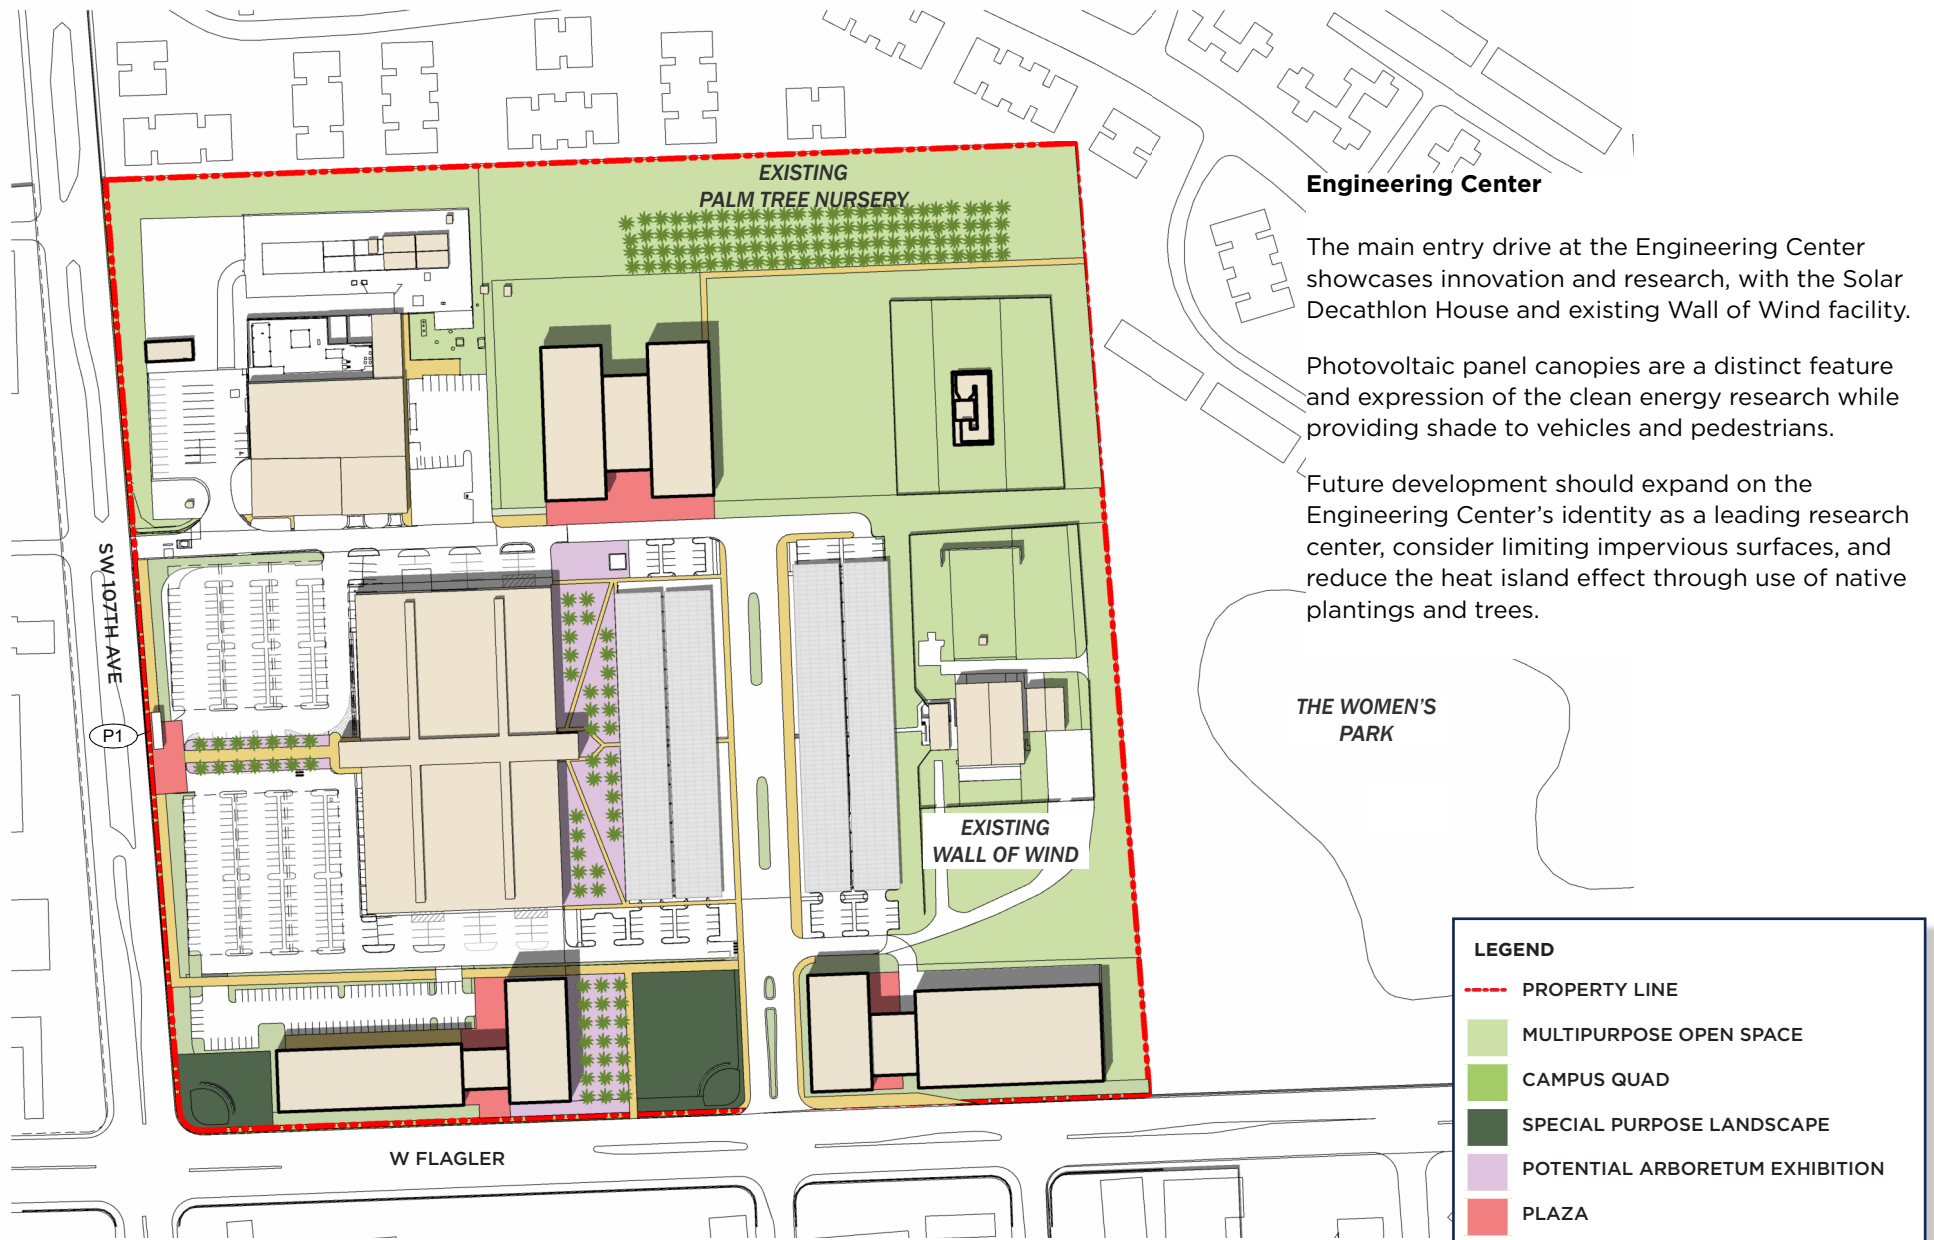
EC 2035 PLAN - OPEN SPACE CONCEPT
